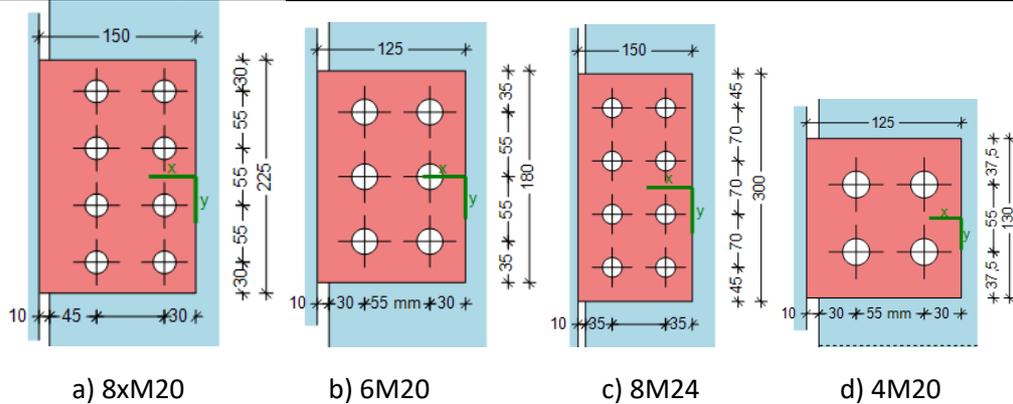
Fin plate beam-to-column joints (a): A-1w, b) A1s, A2, B1, B3, c) C-2w, C-3w, d) D-3s, D-3w) – 10 mmS355 thick fin plate – 10.9 bolts – 6 mm welds for the fin plates
